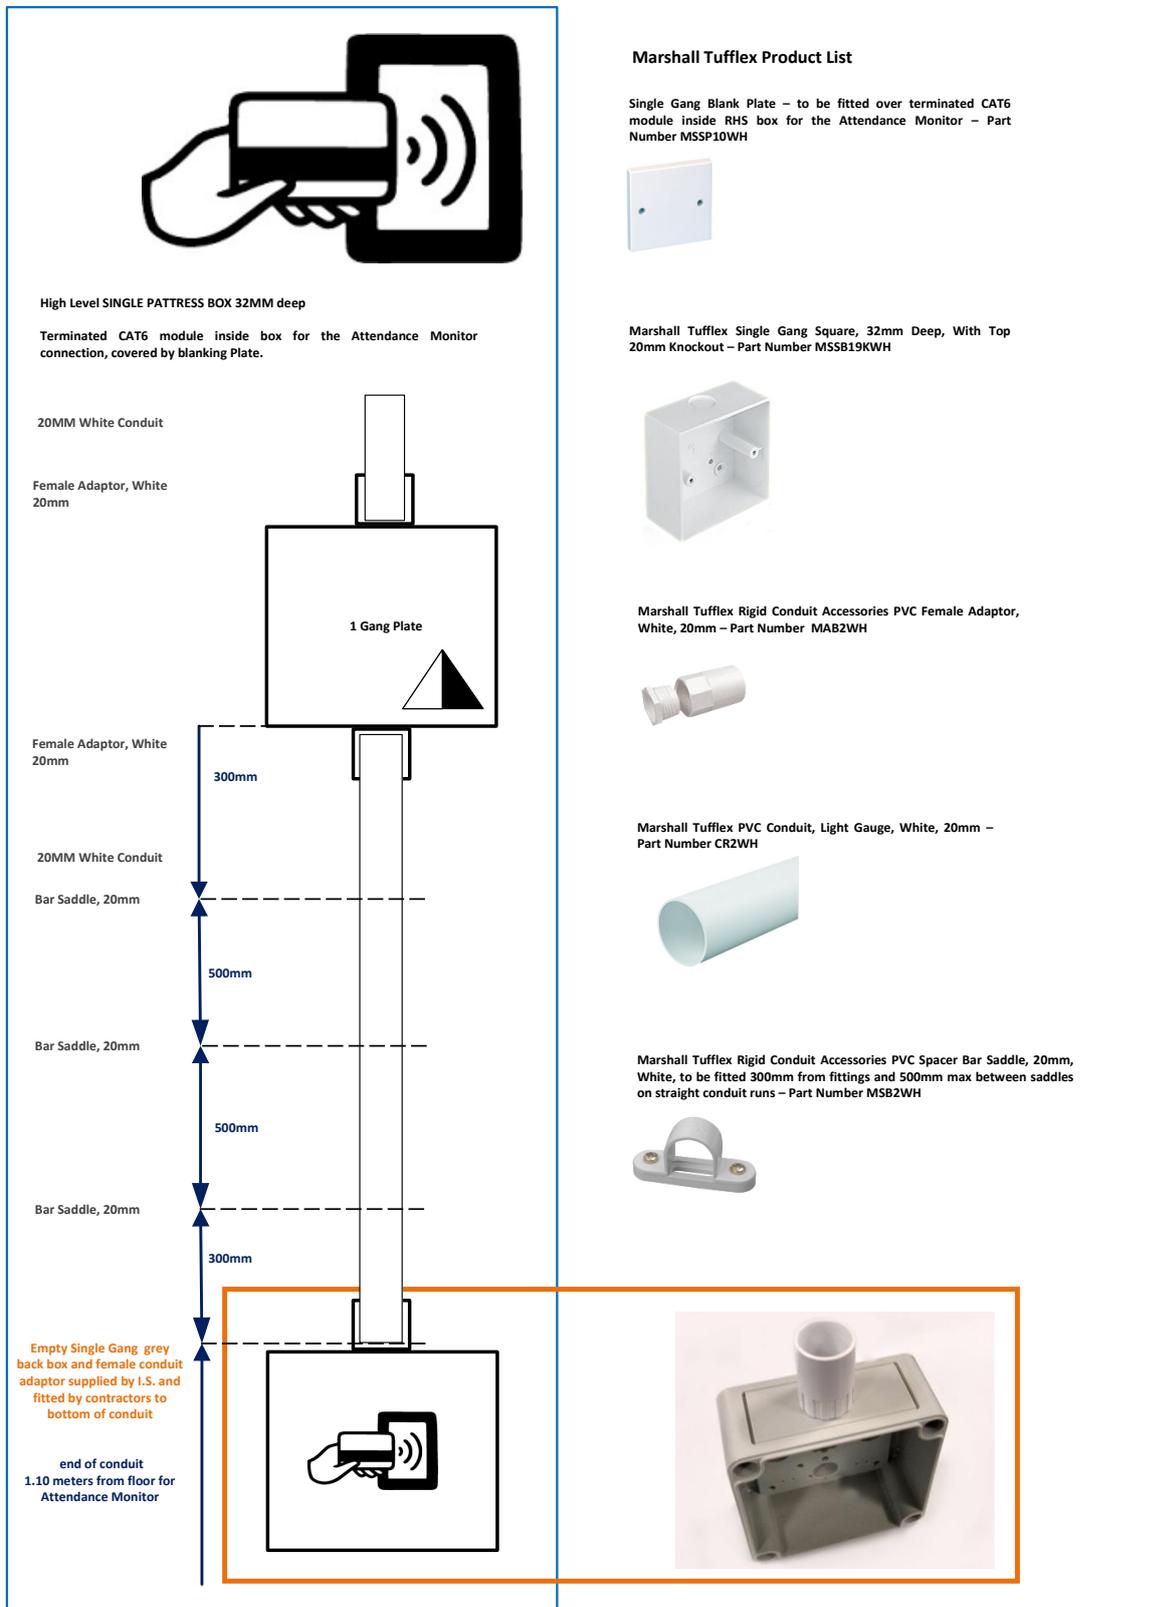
Attendance Monitor Point - Installation in Rooms without Ceiling Tiles
